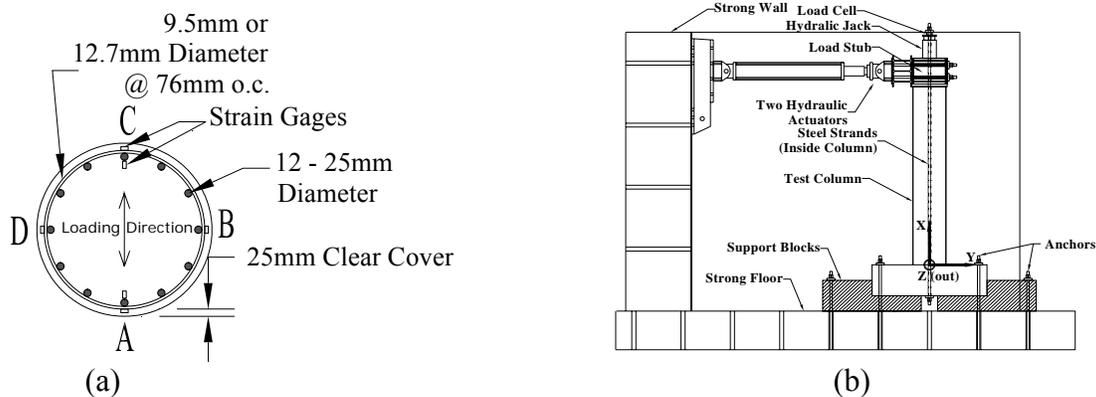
(a) Column cross sectional detail and (b) test setup elevation
